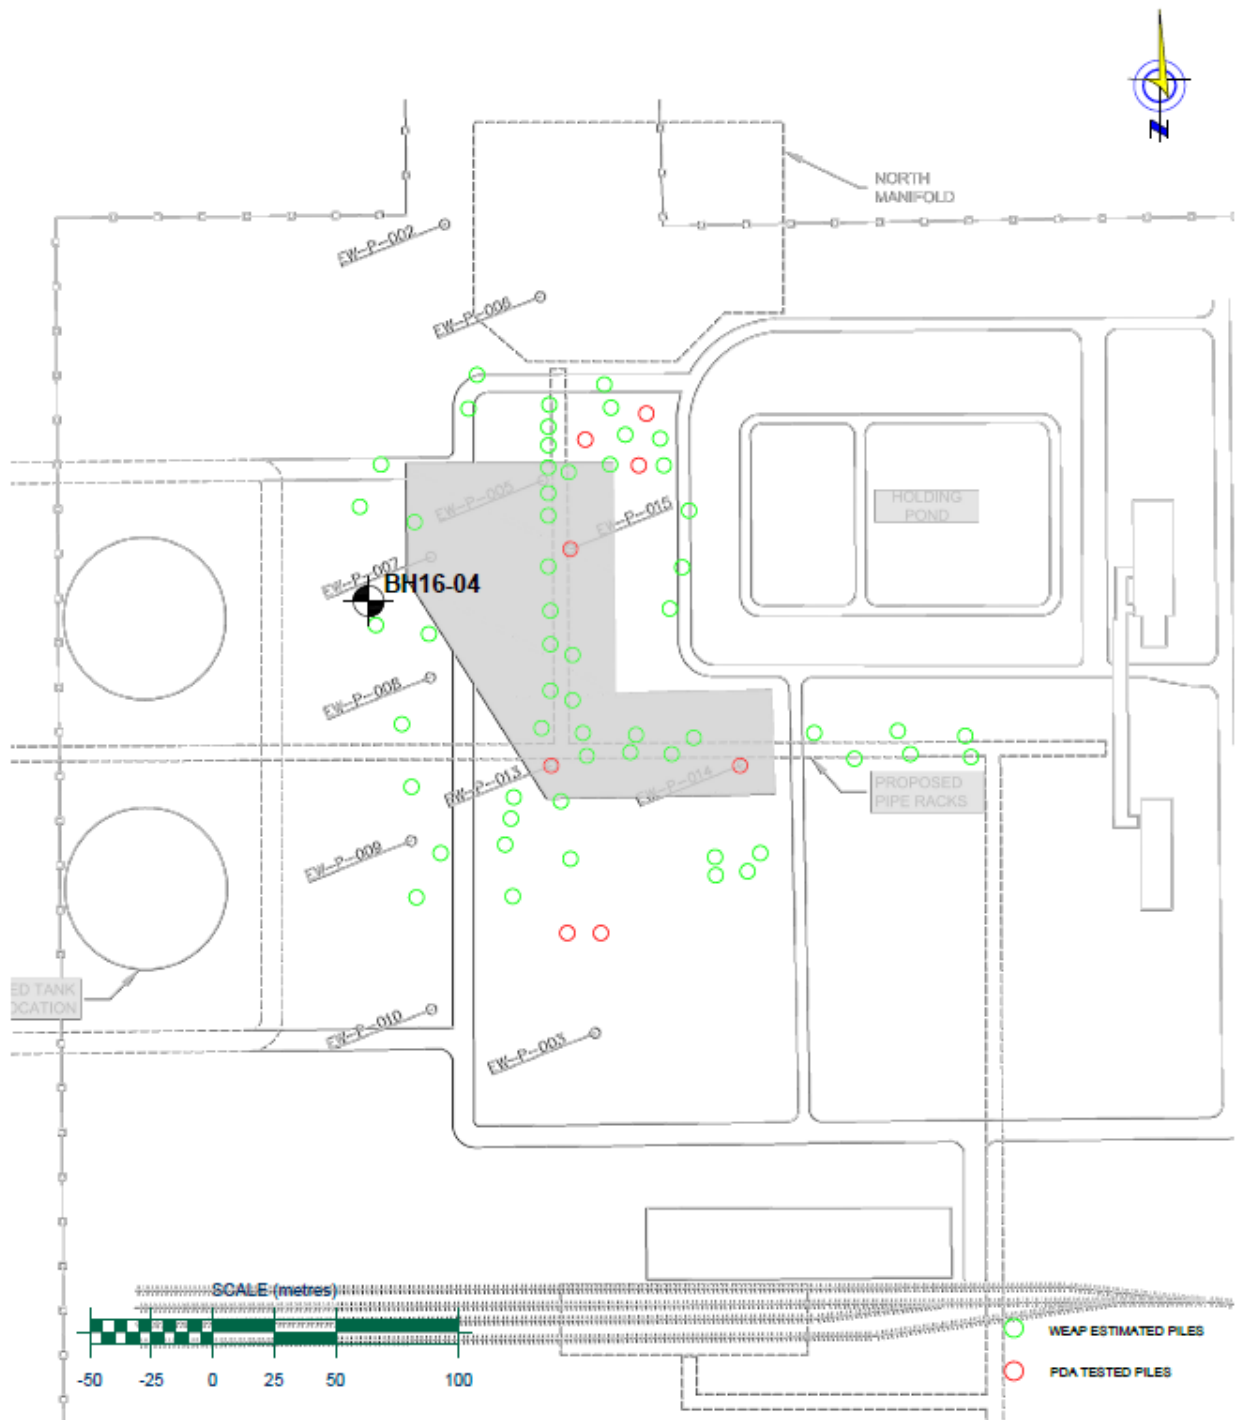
Site and Pile Layout Plan Showing Studied 508-mm Piles
